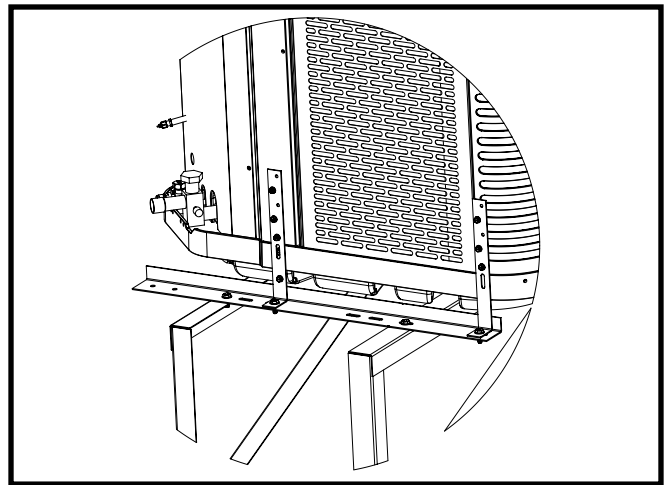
Rear Brackets For Large Footprint - Control Panel Left
